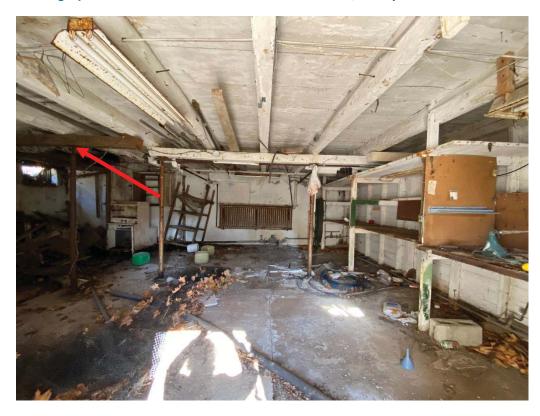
Basement Steel Column supporting House Main Floor; Stains and Debris on Floor
